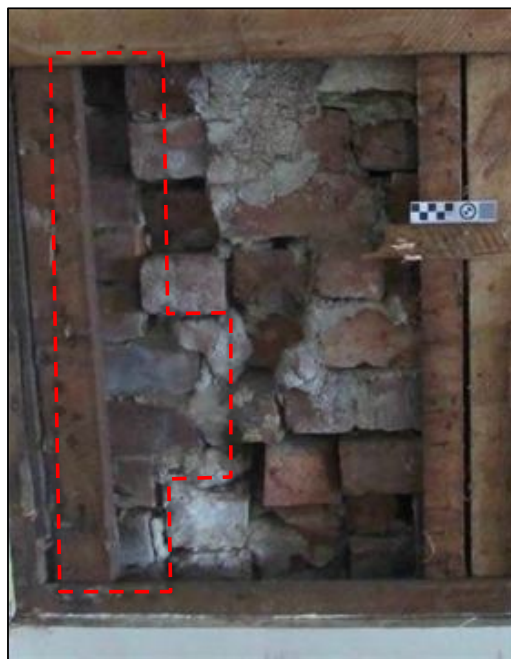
Photo of sample area 23B showing section of brick wall extension (outlined in red) visible extending north of the remnants of the removed wall (photo faces east).
